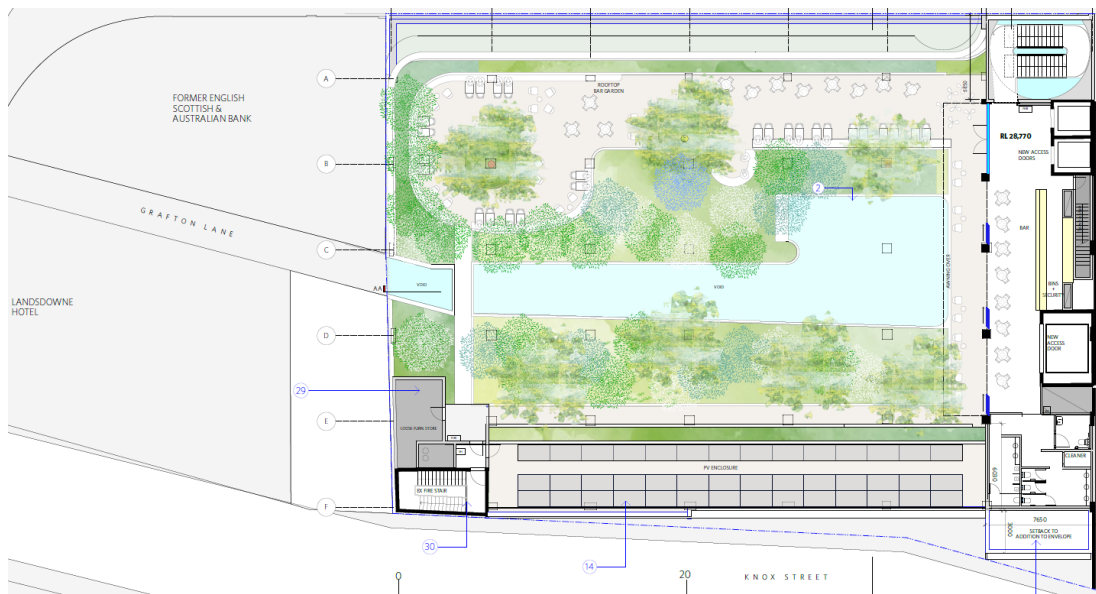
Rooftop bar locality and layout plan (Durbach Block Jagers)
